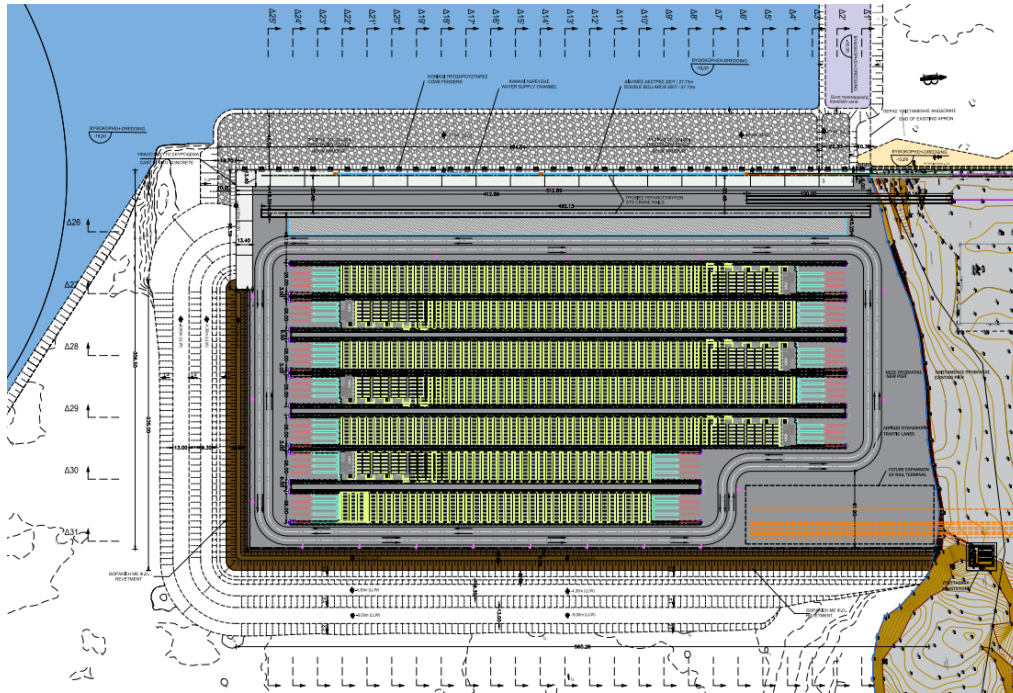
General layout of Pier 6 Expansion according to the approved Design
